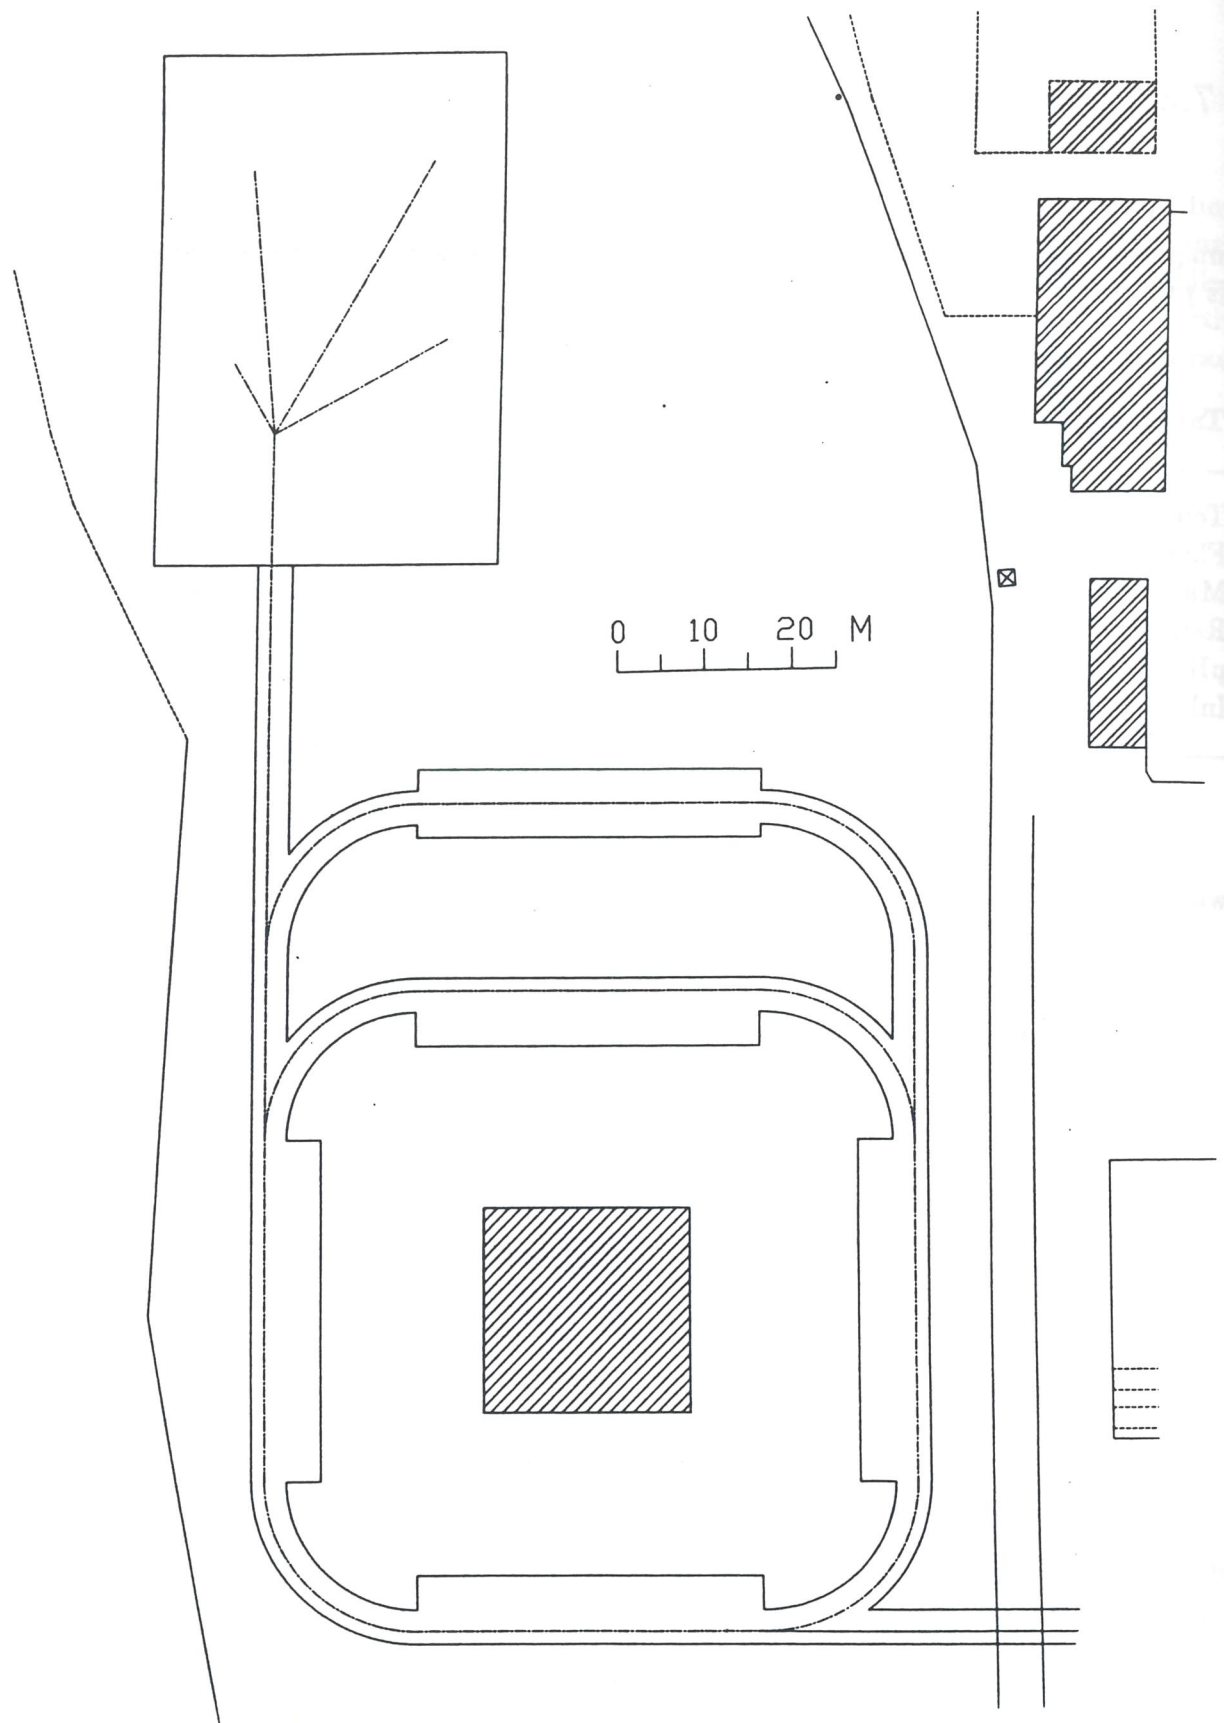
Tunnel and Buildings for the ADRIA Complex
